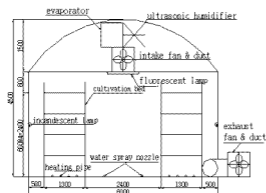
Plan of *Pleurotus eryngii* cultivation house (unit : mm).
